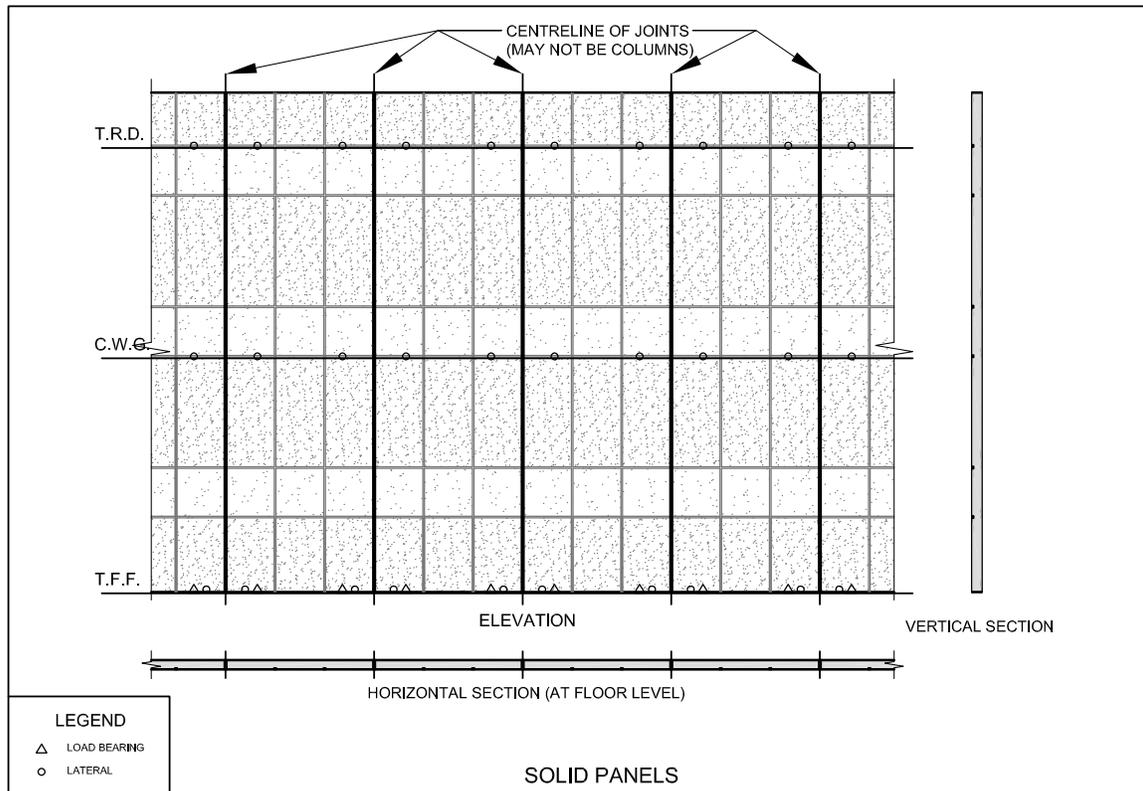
Solid wall panels with reveals. Source: M. E. Hachborn Engineering
